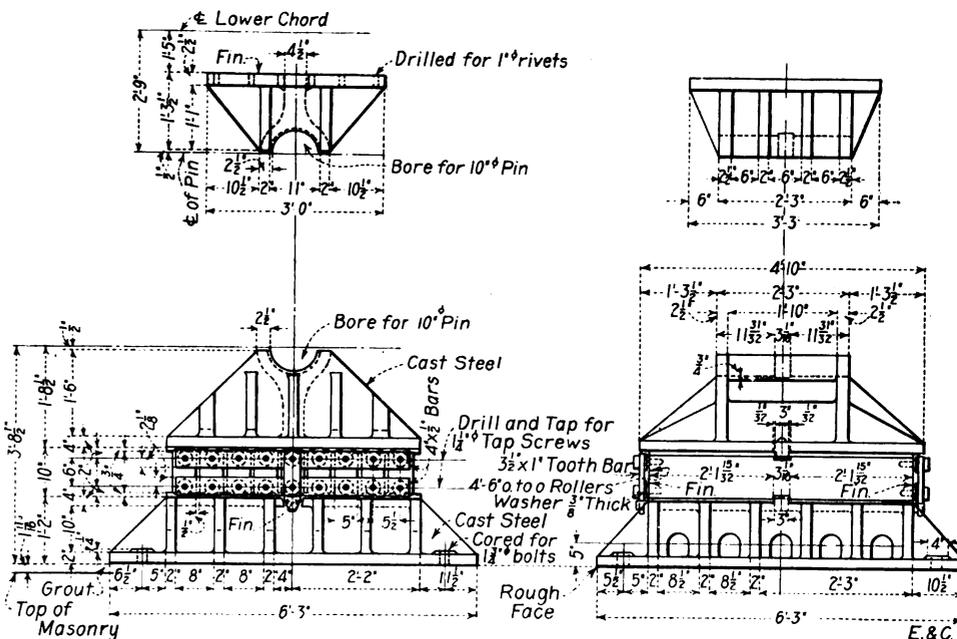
Details of Roller Shoes for Truss Span at Pier No. 2 of East Kansas Ave. Bridge.
